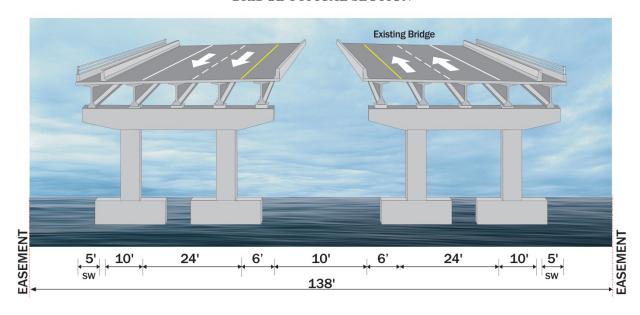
RYE ROAD ALTERNATIVE TYPICAL SECTIONS
